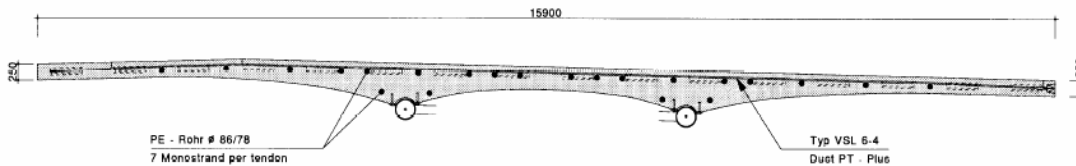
Precast Concrete Slab Cross-Section Detail
